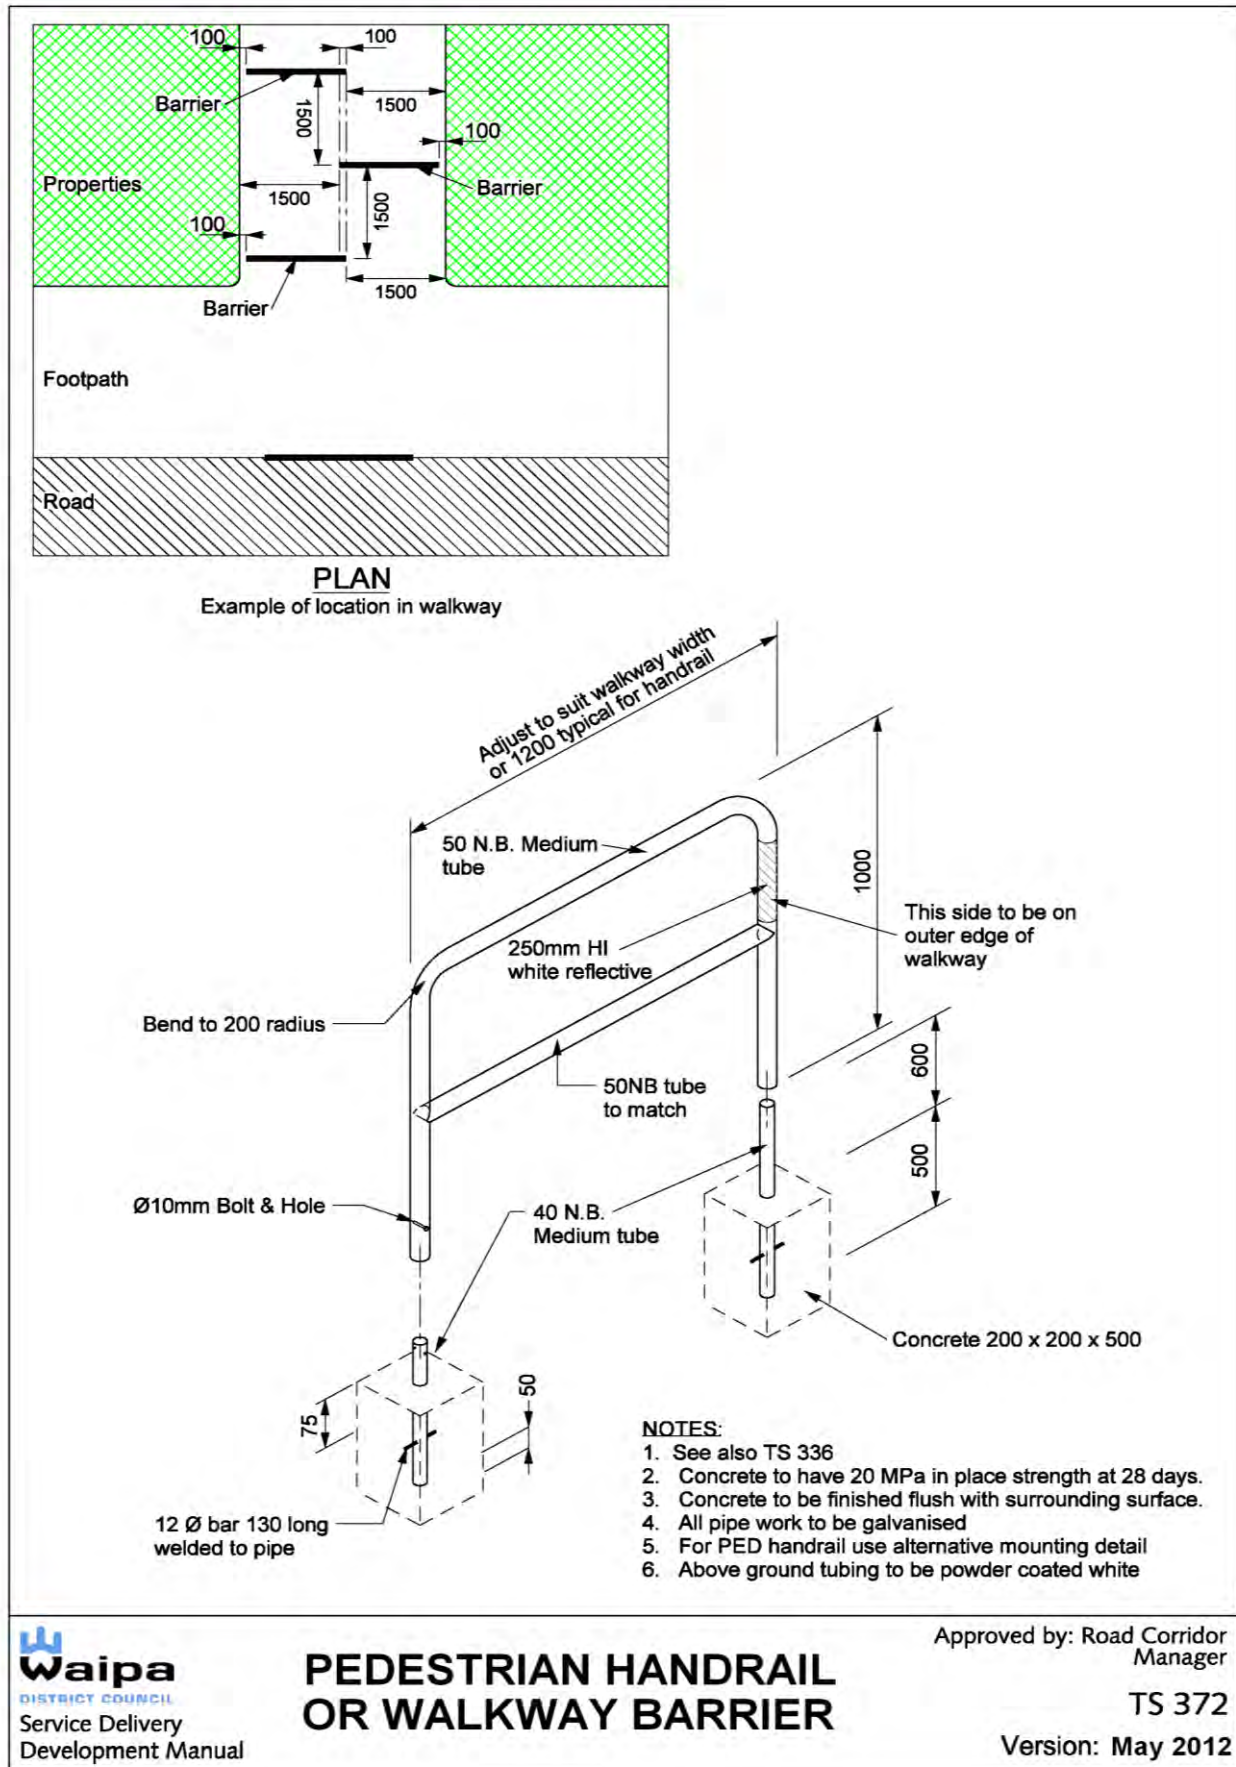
TS 372 Pedestrian handrail or walkway barrier
